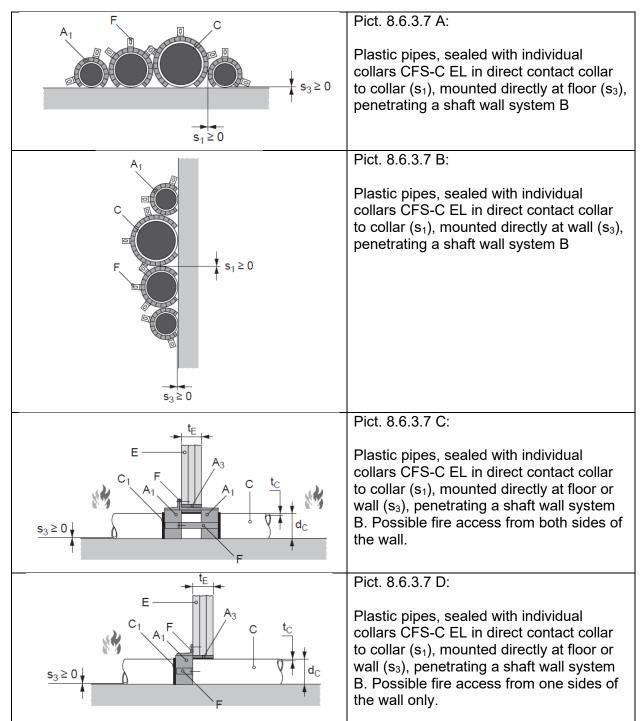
Plastic pipes, side by side in zero distance, sealed separately, mounted onto floor or onto wall
